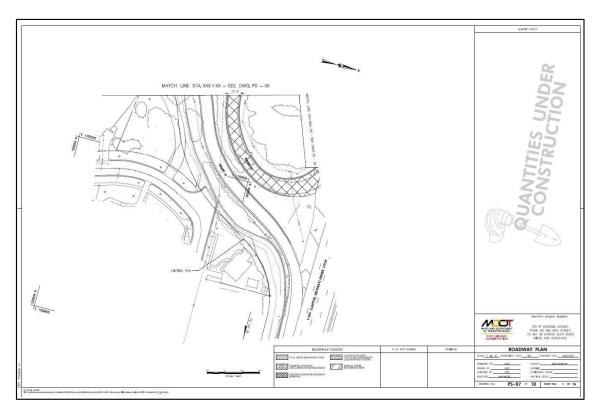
Plan View – I-495 Inner Loop On-Ramp
